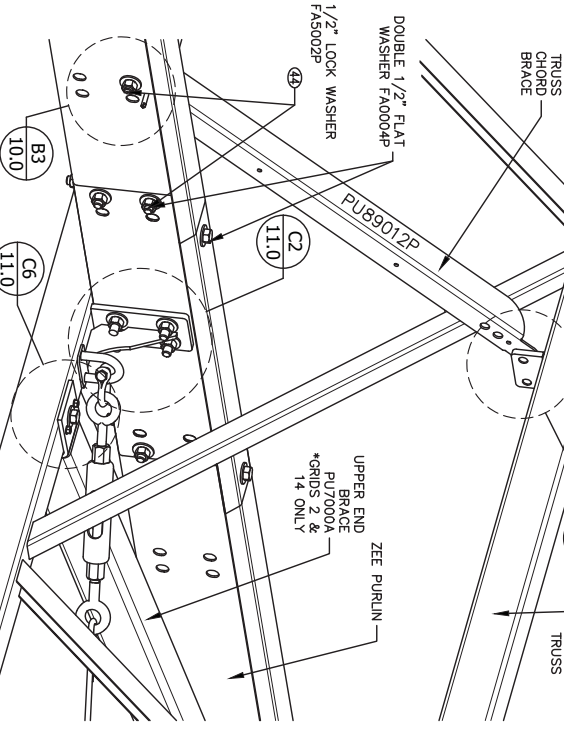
70'-80' VP CHORD BRACE TO ZEE PURLIN CONNECTION
